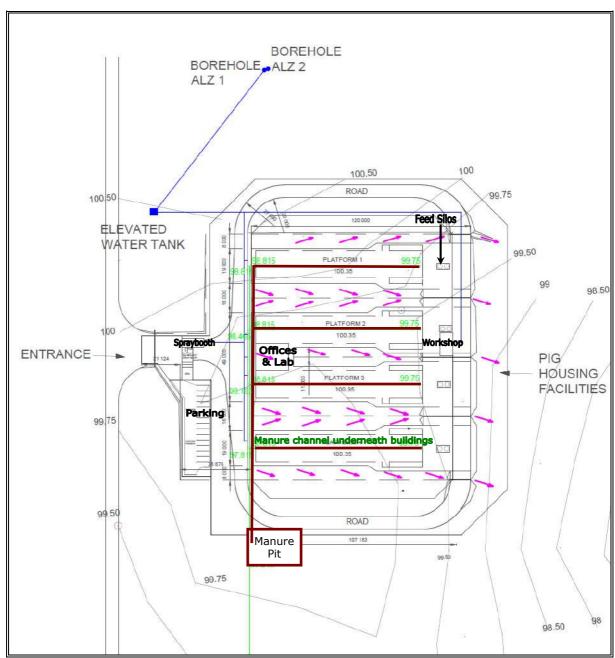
Layout 6 (adapted from Hlasane, 2018 and Paul Roos, 2017)
